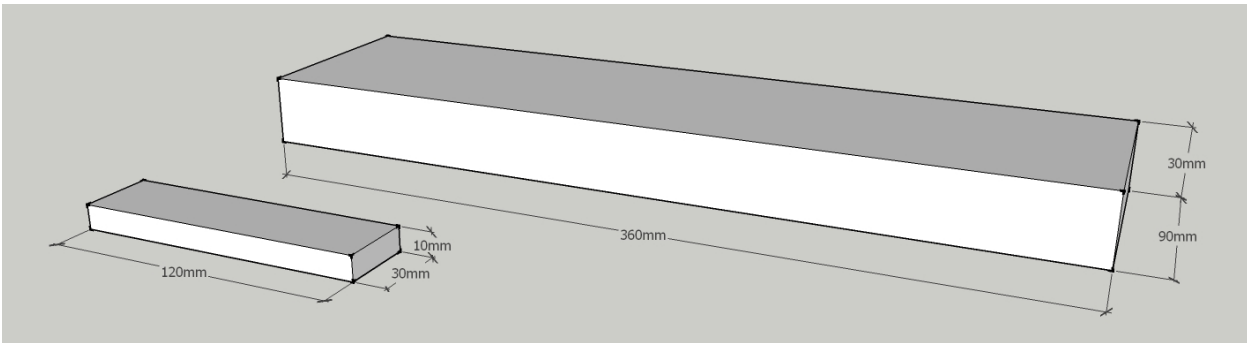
Dimensions of the 3-dimensional geometrically similar specimens.
